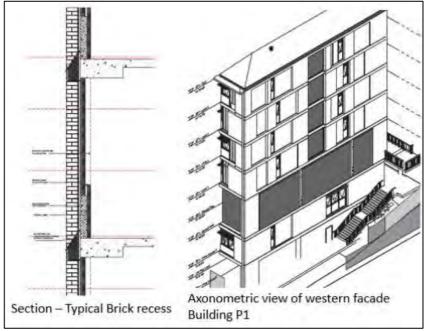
| Proposed brick recesses to Building P1 facade (Base source: RtS 2020)
